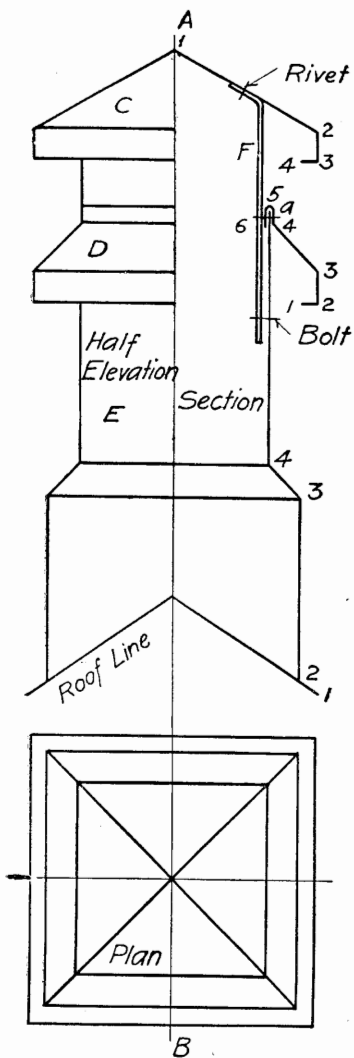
Half Elevation, Section, and Plan of a Square Ventilator.
